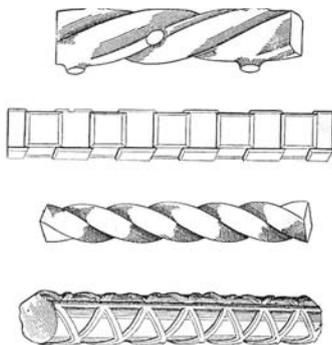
Examples of early steel bars designed to improve the bond between concrete and steel (from Kidder 1909).
